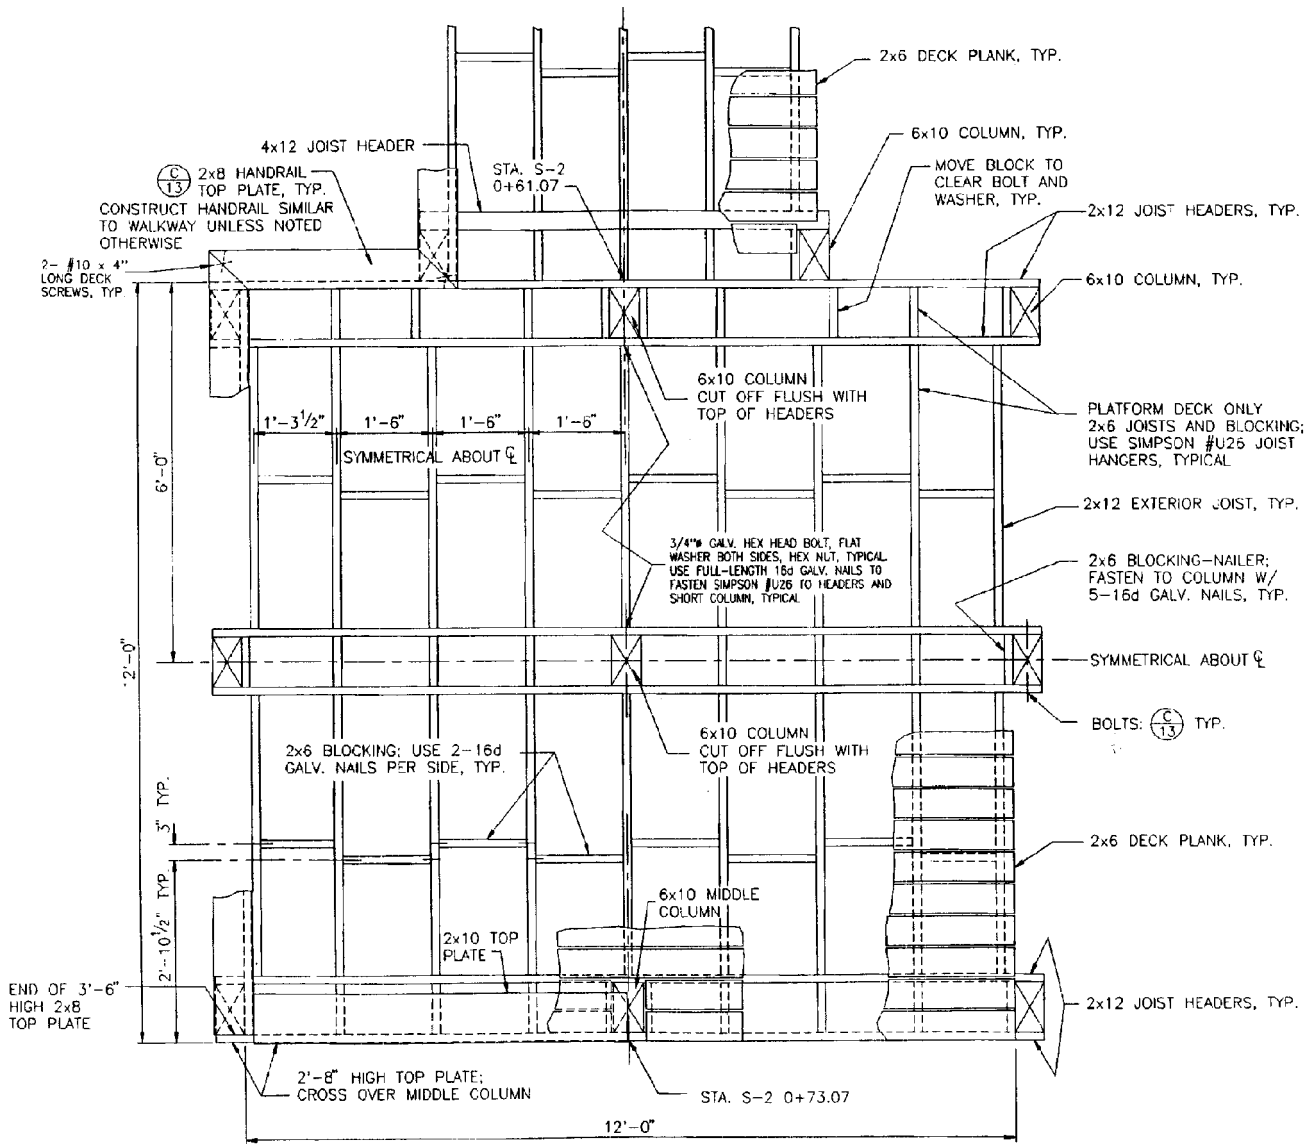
Framing plan for boardwalk, side view. Pinned piling and cross bracing were used in sediment areas.
